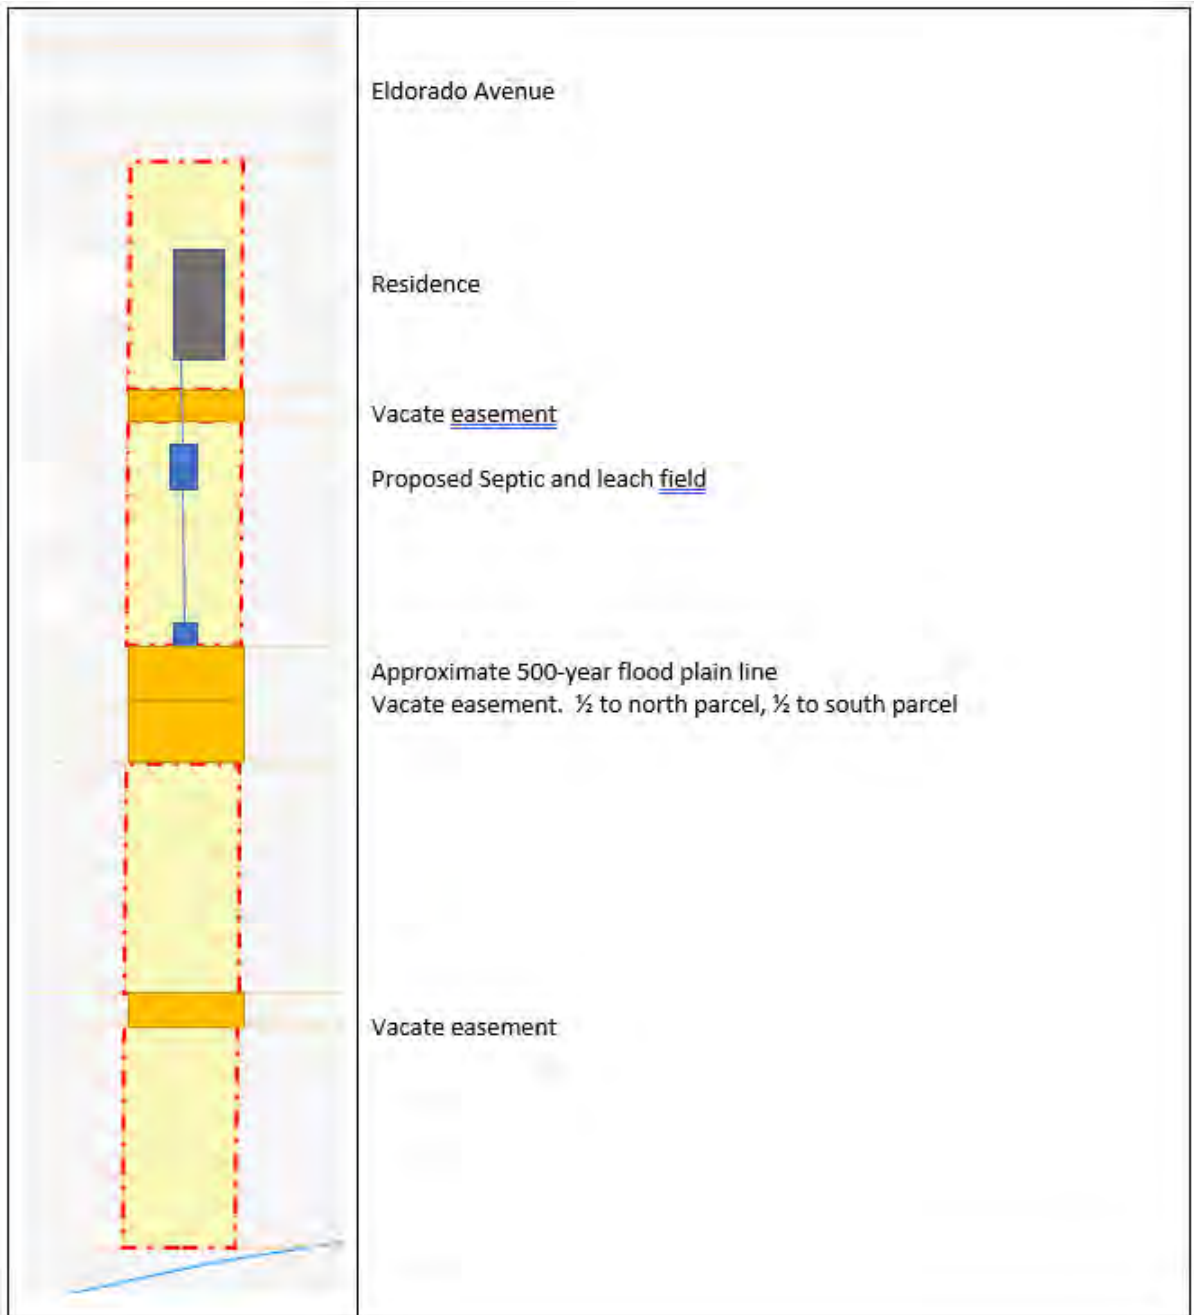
Applicants' proposed site plan showing vacation of all ROWs
